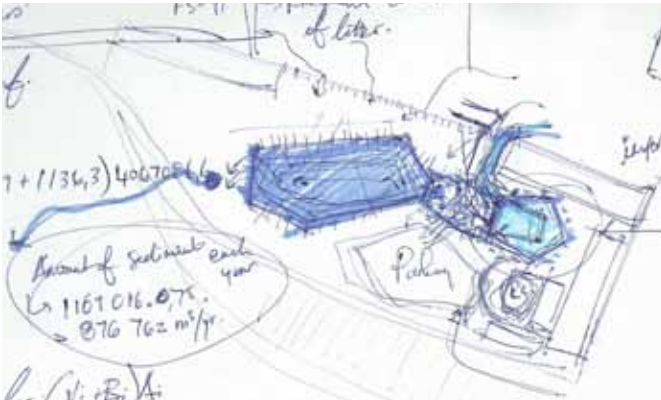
CONCEPT PLAN (AUTHOR, 2011)
